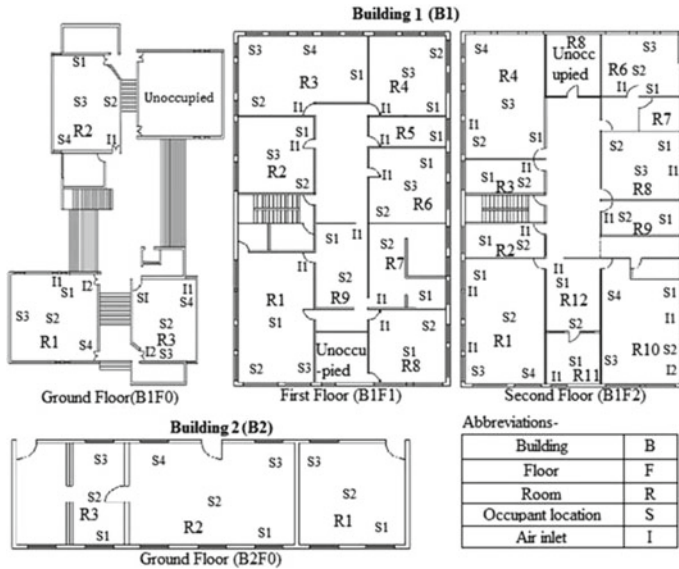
Floor plan and potential occupant location at old administration and CEE building
